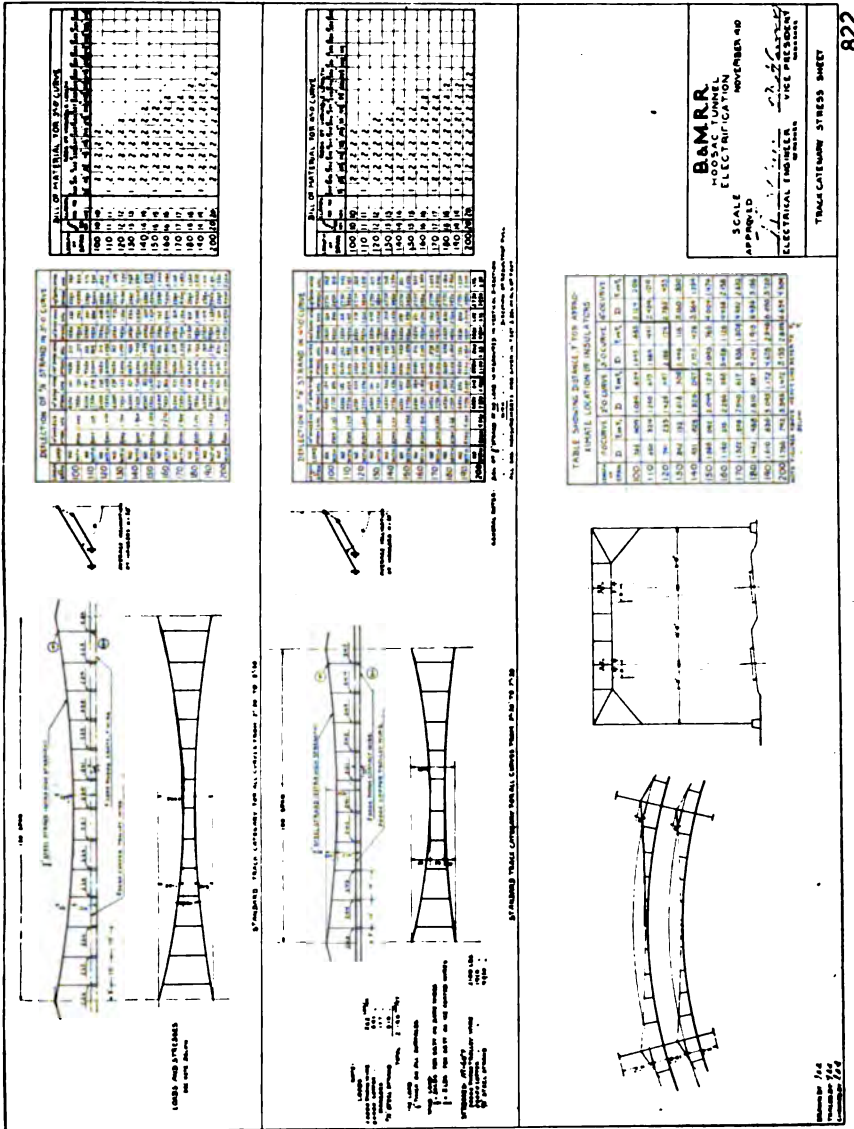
Hoosac Tunnel track catenary stress sheet
